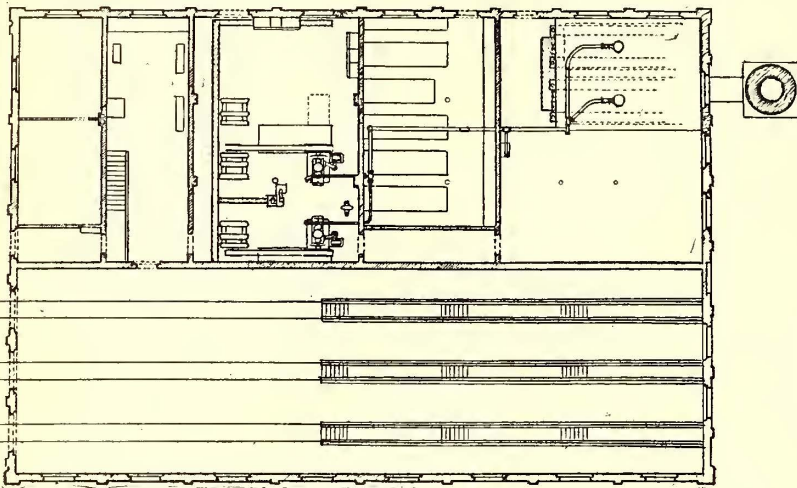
PLAN OF POWER STATION AND CAR HOUSE—ZURICH ELECTRIC RAILWAY.
